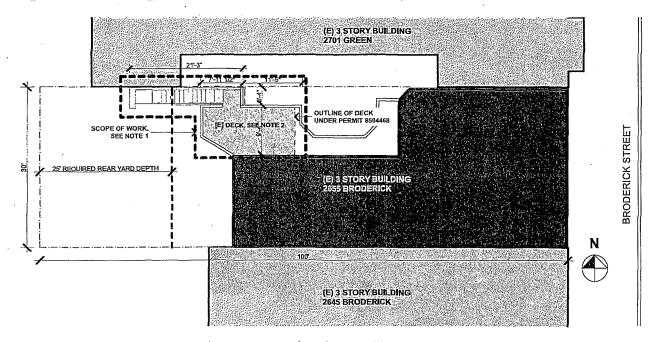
Site Plan showing scope of work under "Permit 1" (from DNM Architect)
